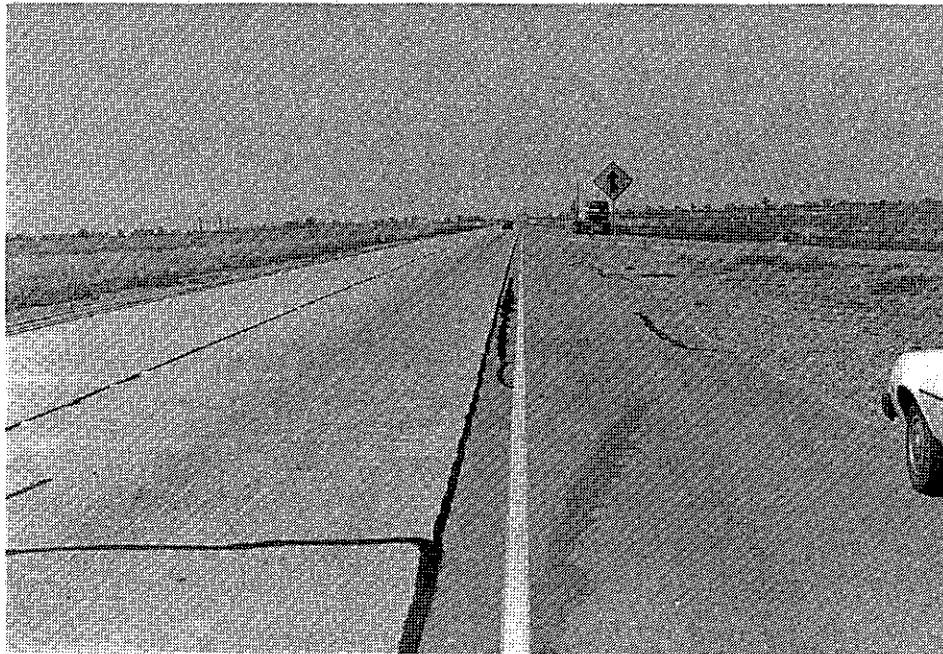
Looking north from same spot as above. Pavement crack is in control area.
